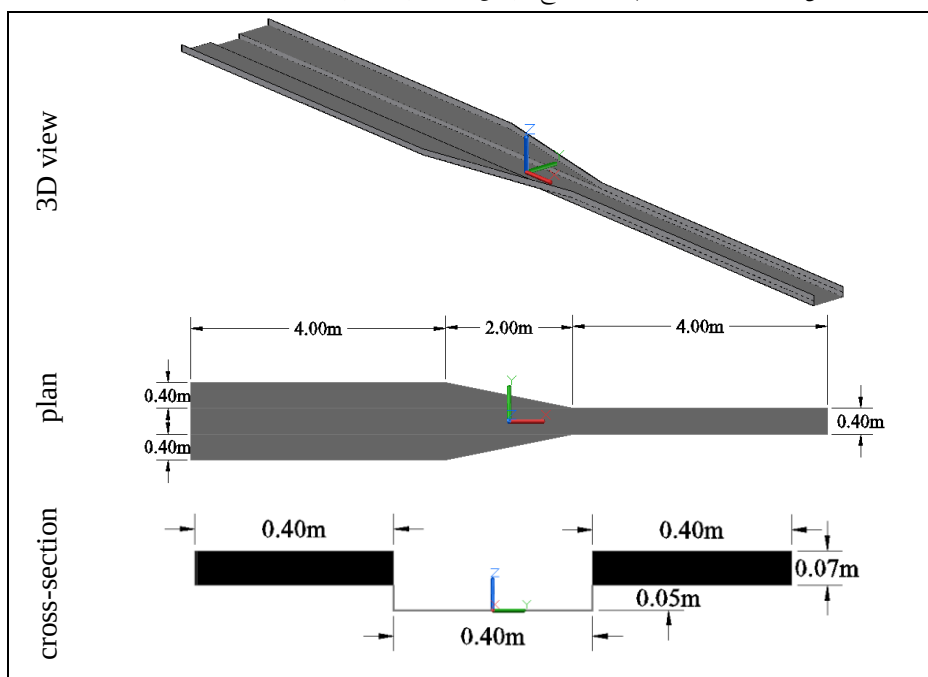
3D view, plan, and cross-section of the modeled non-prismatic compound channel
